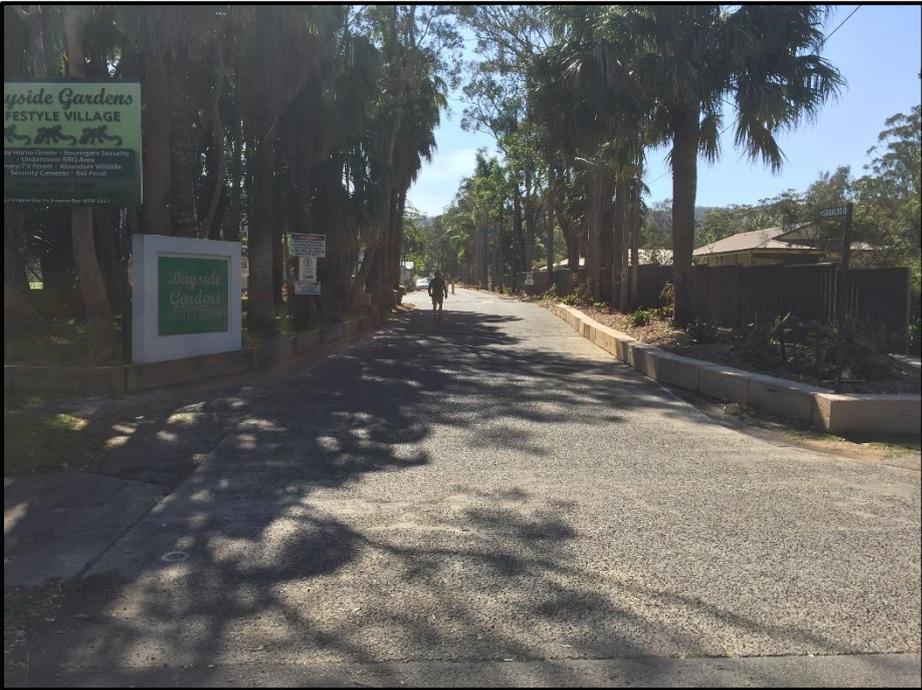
Existing access into the subject site off Wards Hill Road access road
